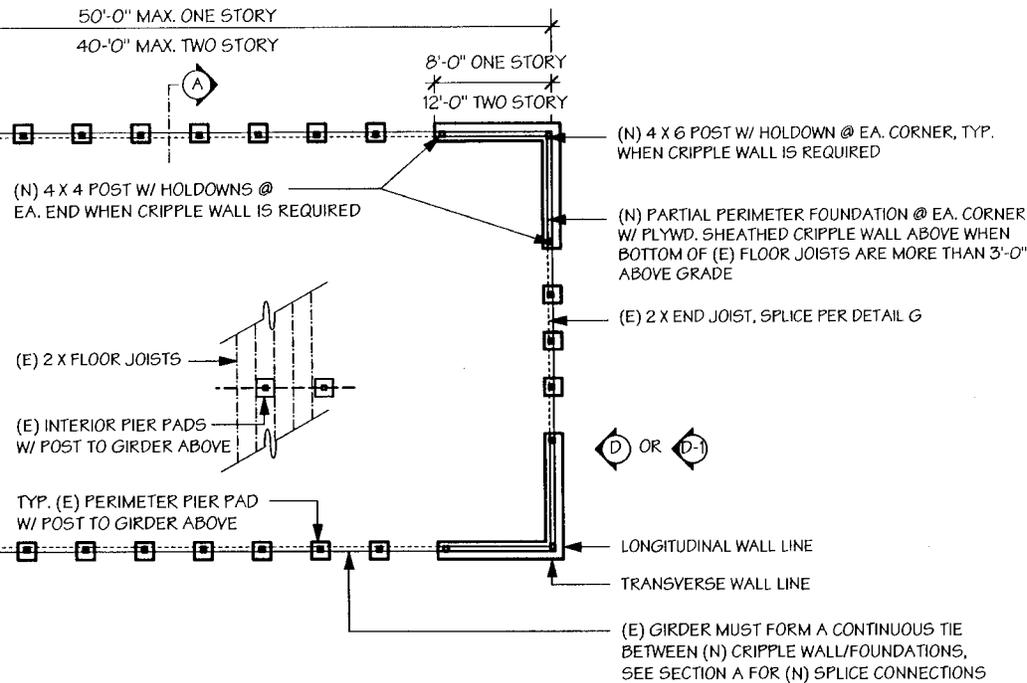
Plan View of Partial Perimeter Foundation System
